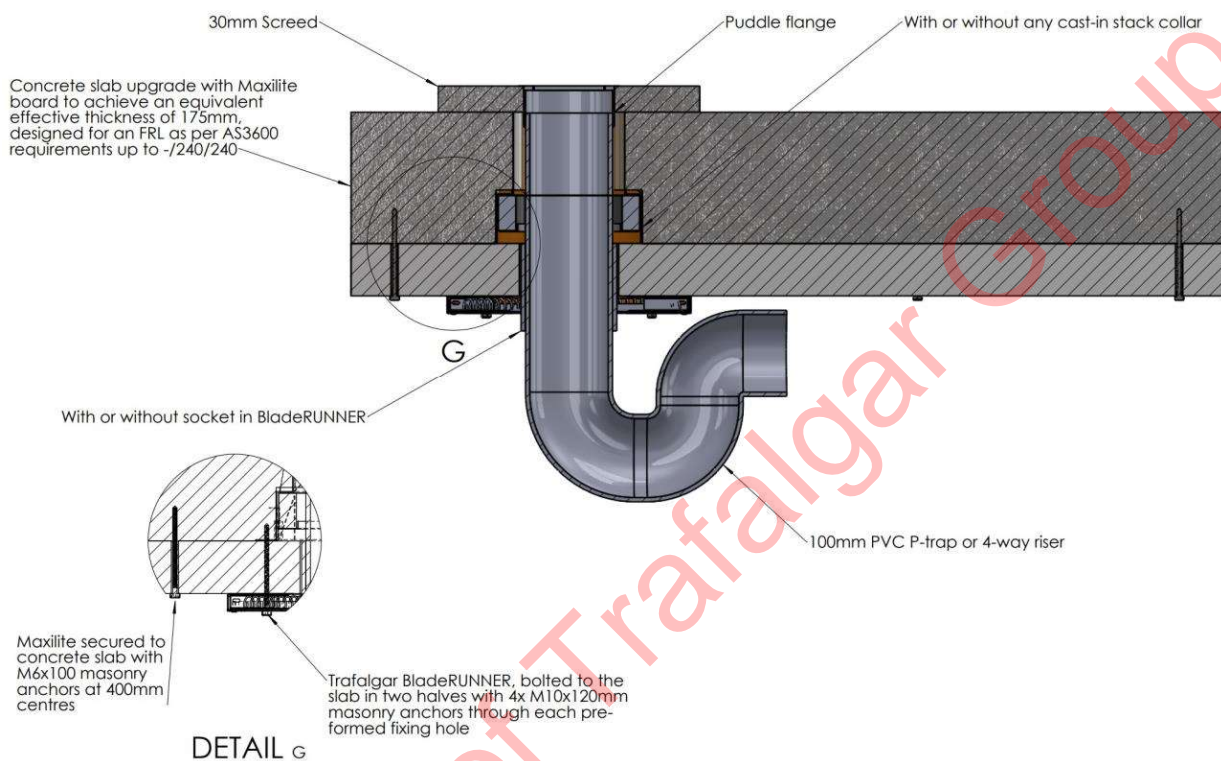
Trafalgar BladeRUNNER installation with Maxilite floor upgrade for Ø100mm uPVC floor waste gully
